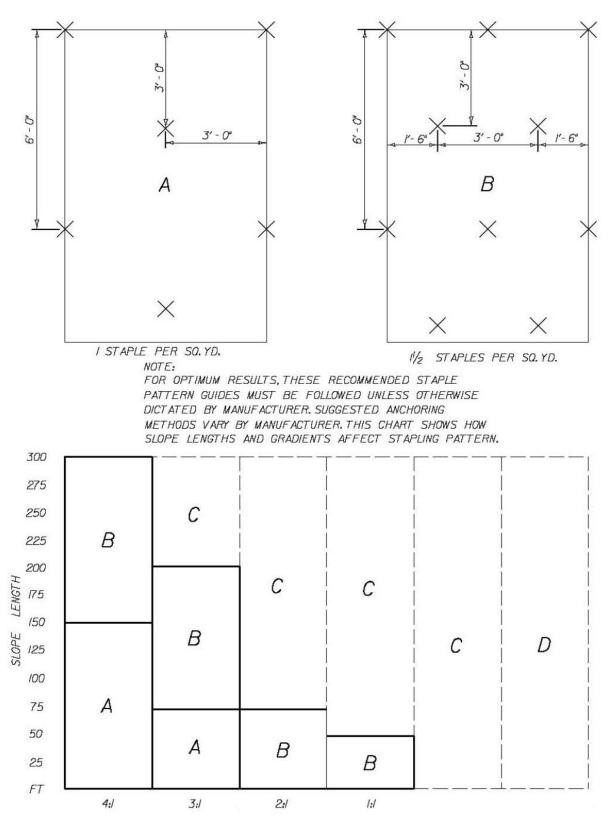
Rolled Erosion Control Products - Steep Slope / Ditch Application
